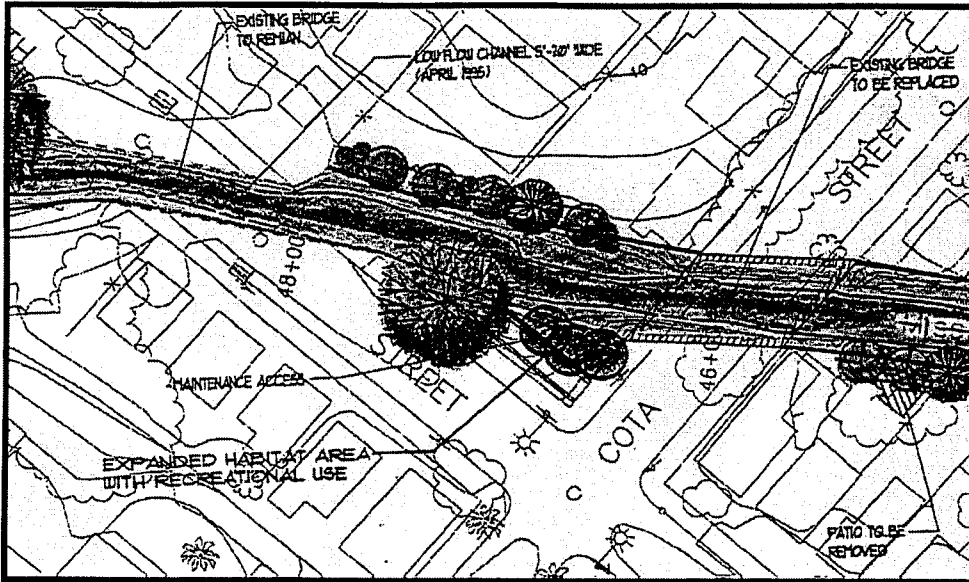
Bath Street Bridge to Cota Street Bridge
